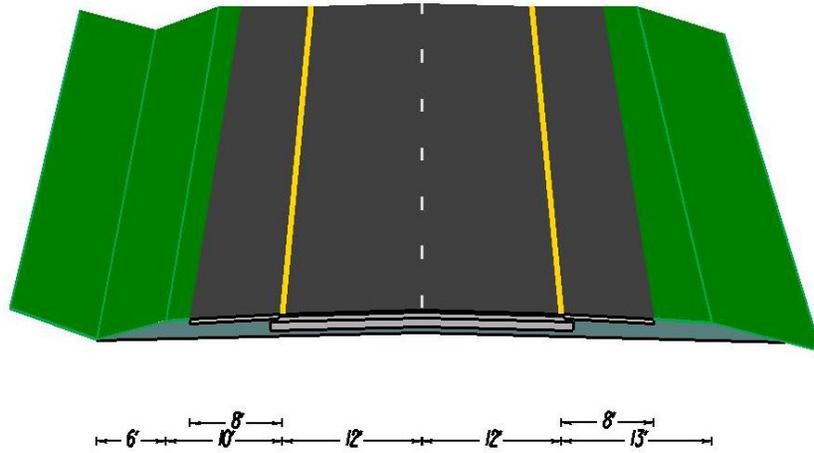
Typical Section for Proposed Bridge Approaches (Routes 501 and 130)
